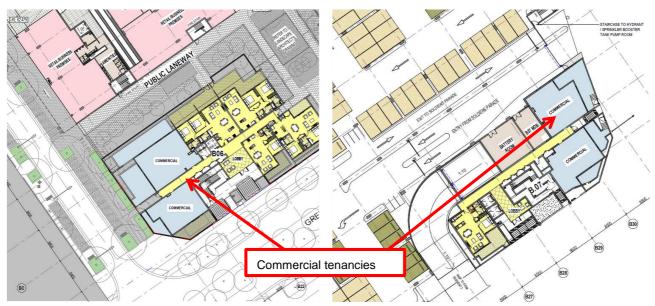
Corner of Greenway and Main Street Figure 9 Corner of Greenway and Soldiers Parade
